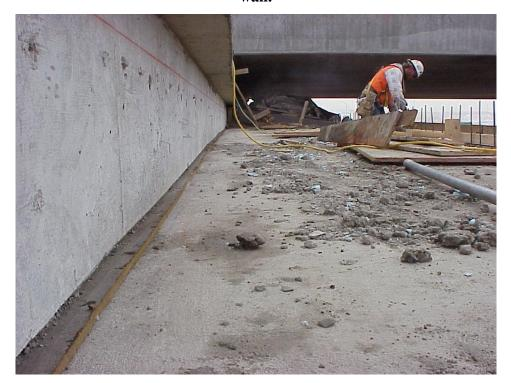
Expansion joint material was installed below the sides of the abutment wall on top of the footing. In the center zone below the abutment wall on top of the footing, galvanized sheet metal centered on a bearing pad was placed (see figure 29).
